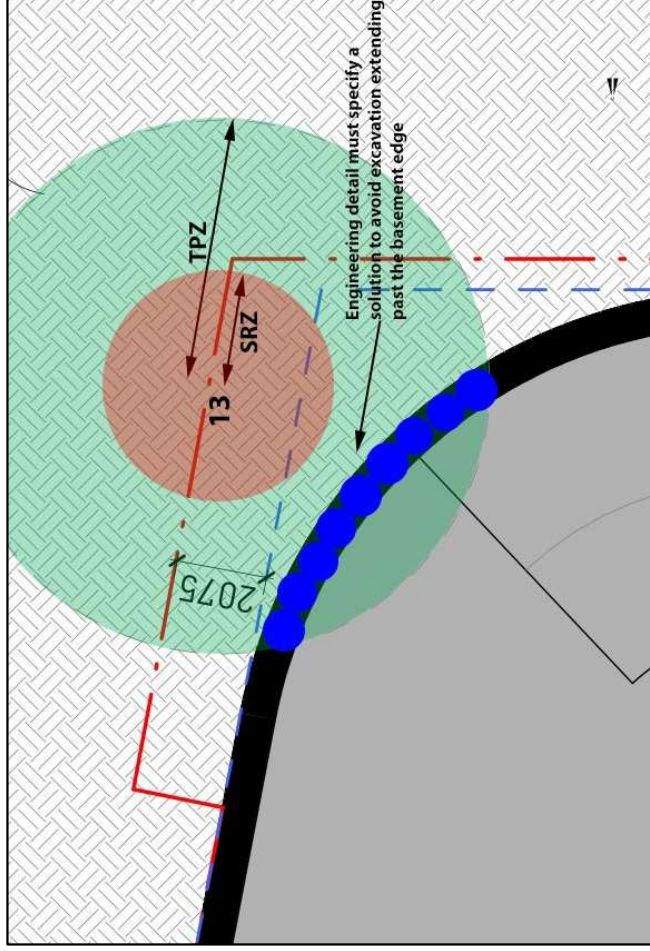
Figure C: Basement Plan mark-up showing the area where excavation must be limited.
